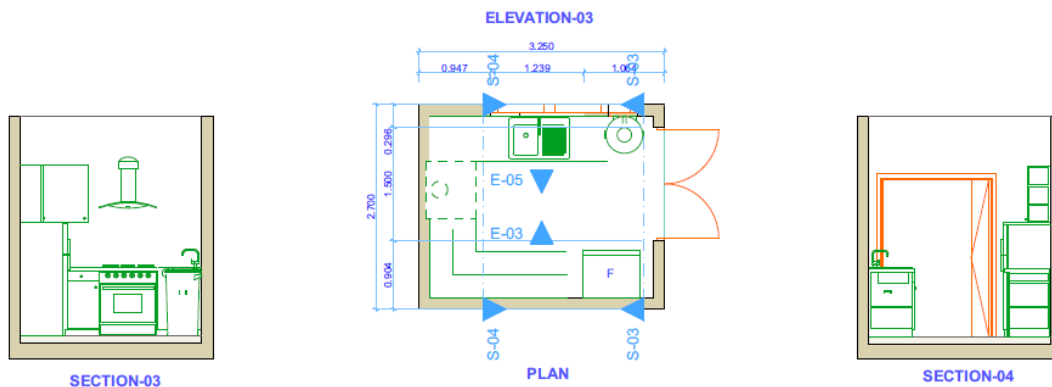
Kitchen Plan and Sections (Image Source: Author)
